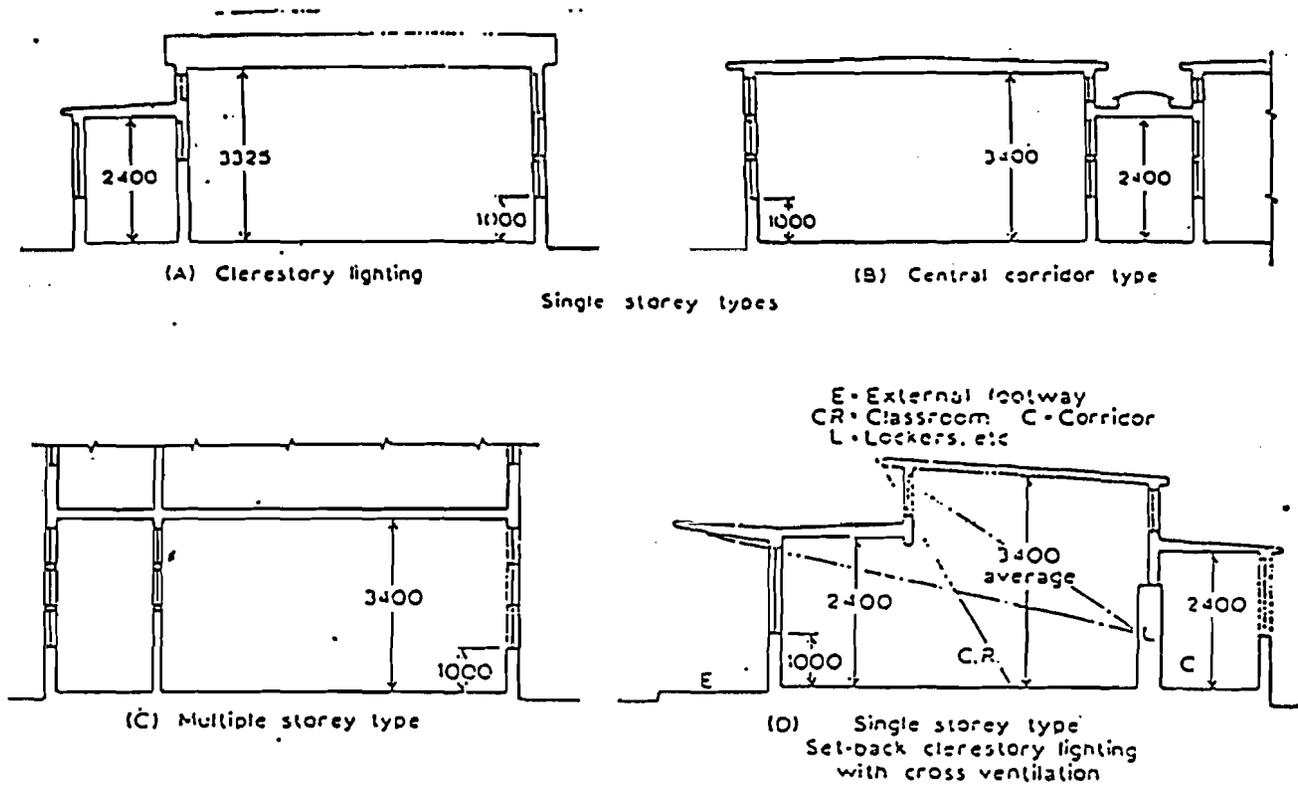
(A) to (C) Classrooms and corridors; lighting and ventilation; (D) Classroom and corridor sections
